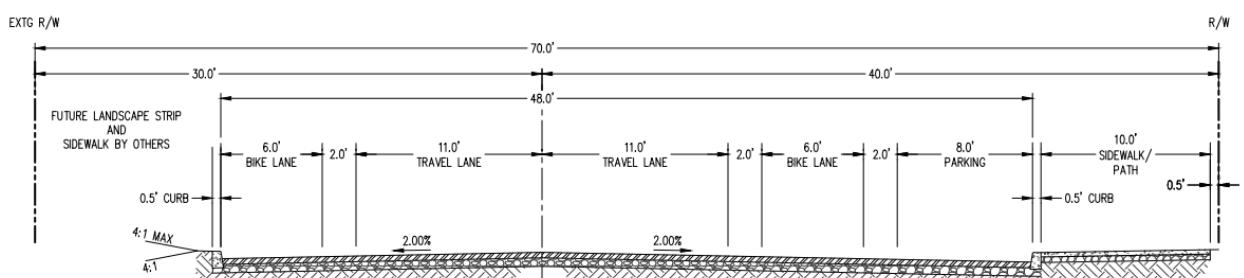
Timber Yards Street and Circulation Plan
